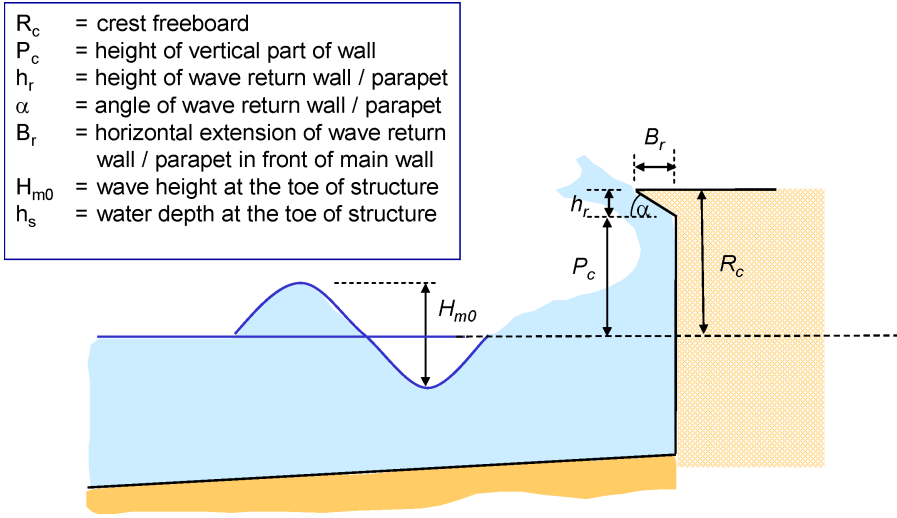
Parameter definitions for assessment of overtopping at structures with parapet/wave return wall.
